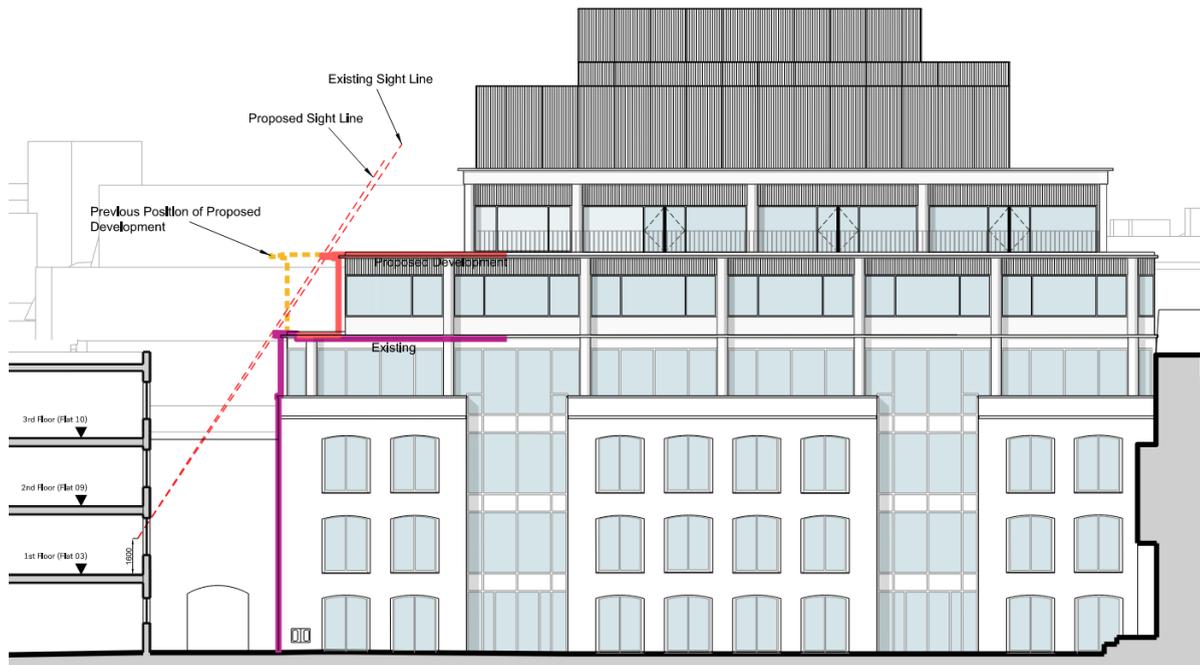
Existing and Proposed sightlines from Flat 3 in the Copperworks
